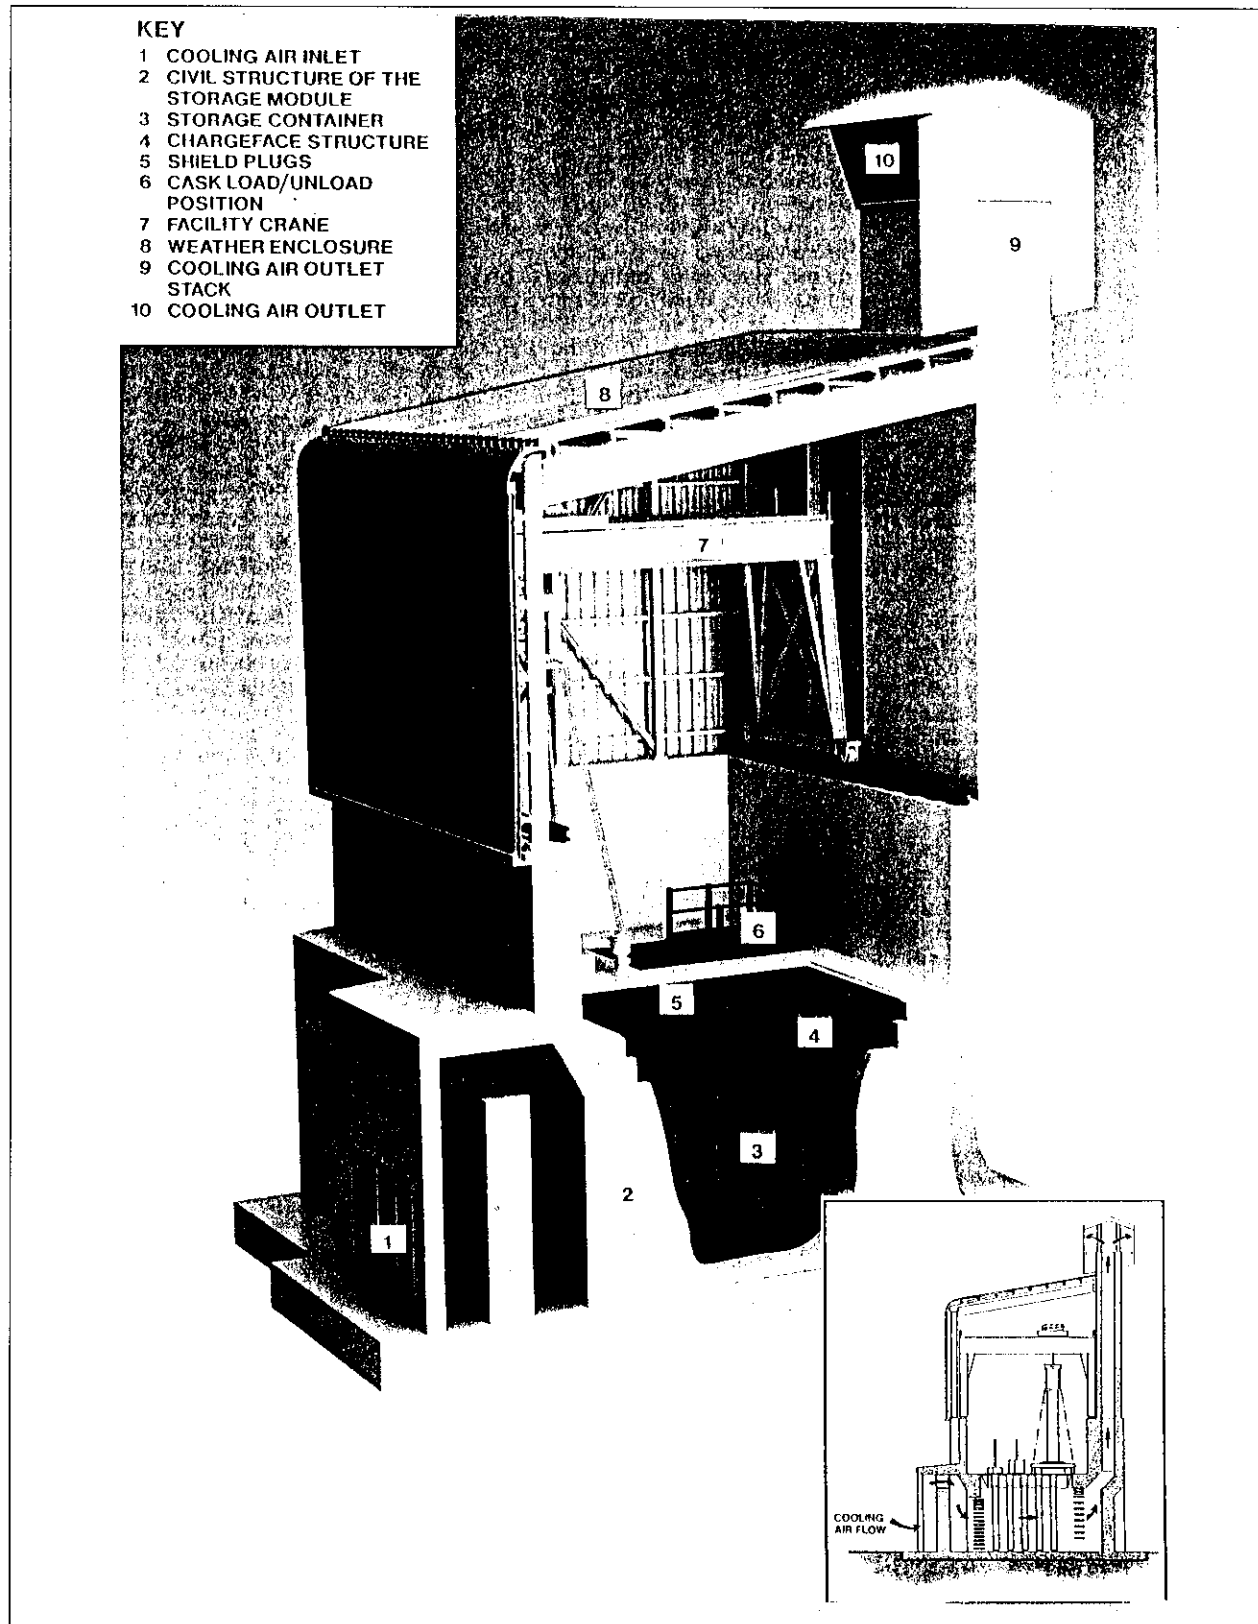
Illustration of a Typical Modular Dry Vault Storage Facility
